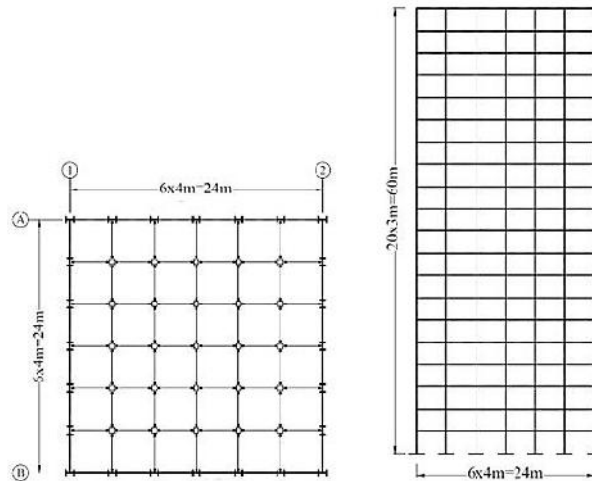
Structural models: General plan and elevation of 20-storey building (Movahed et al. 2014)
